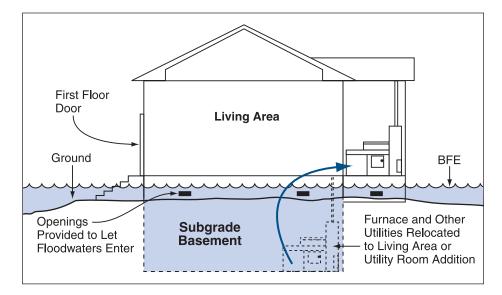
illustrates a home in which the lower level was modified to create an enclosure that is built with flood damage-resistant materials, has service equipment elevated above the flood level, and is used solely for parking, building access, or storage. As illustrated in Figure 3-8, openings need to be placed in the walls to relieve hydrostatic pressure. If the lowest elevated floor is above the community's DFE and the enclosure is protected as described above, the home would meet the minimum requirements of the NFIP. Wet floodproofing would not be practical for most slab-on-grade homes, in which the living space is at or very near the ground level. Whether or not wet floodproofing is appropriate for your home will depend on the flood conditions, the DFE you have selected, the design and construction of your home, and whether you are required to bring your home into compliance
